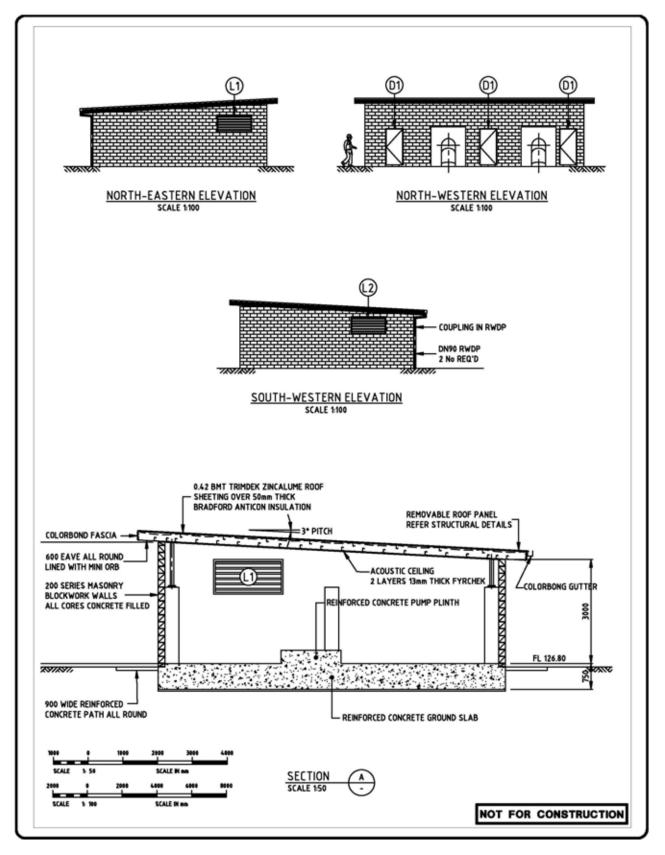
INDICATIVE EXAMPLE OF A PUMP STATION PLAN
